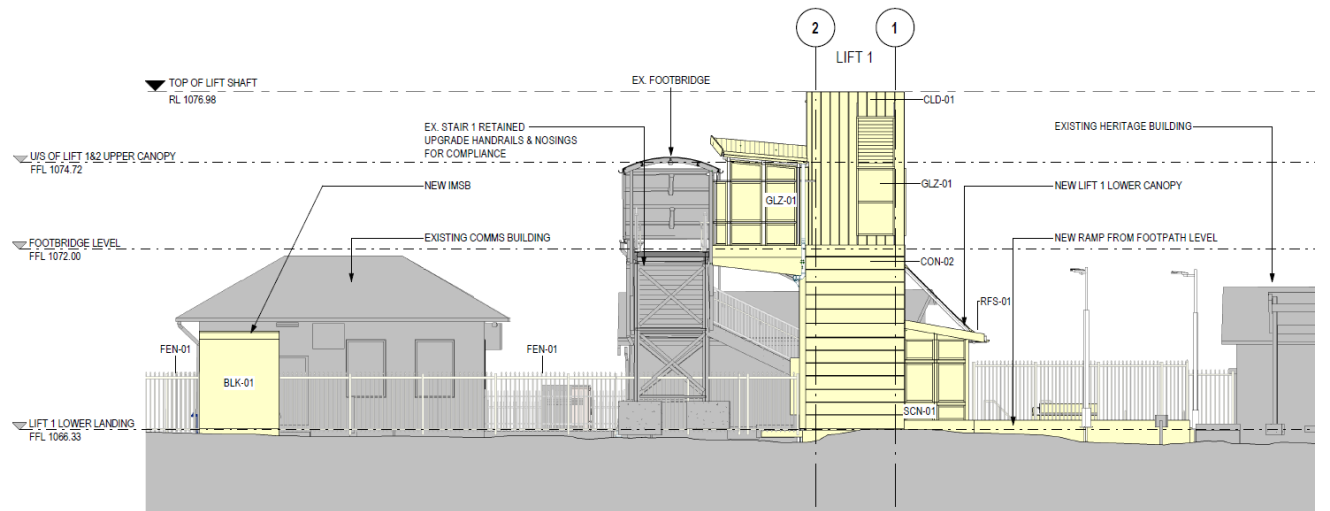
Platform long section, extracts from Arenco DesignInc General Arrangement Architectural Drawings, February 2022
